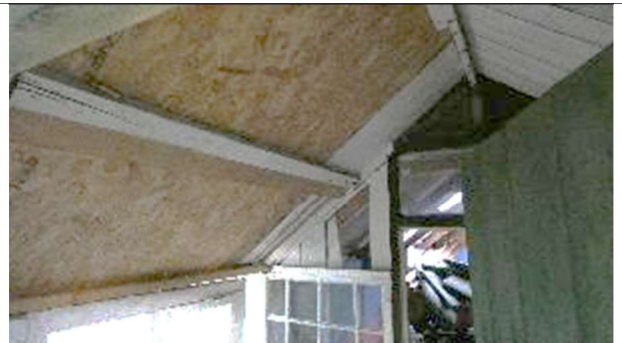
Pitched roof and internal view entering the shed B2 from the north-west.
